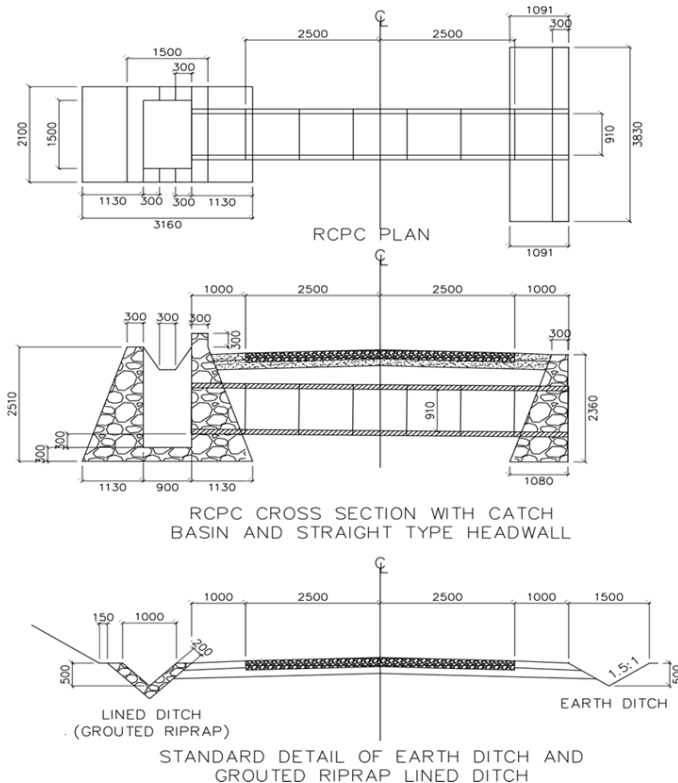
Standard details for cross drain, earth ditch, and grouted riprap lined ditch
